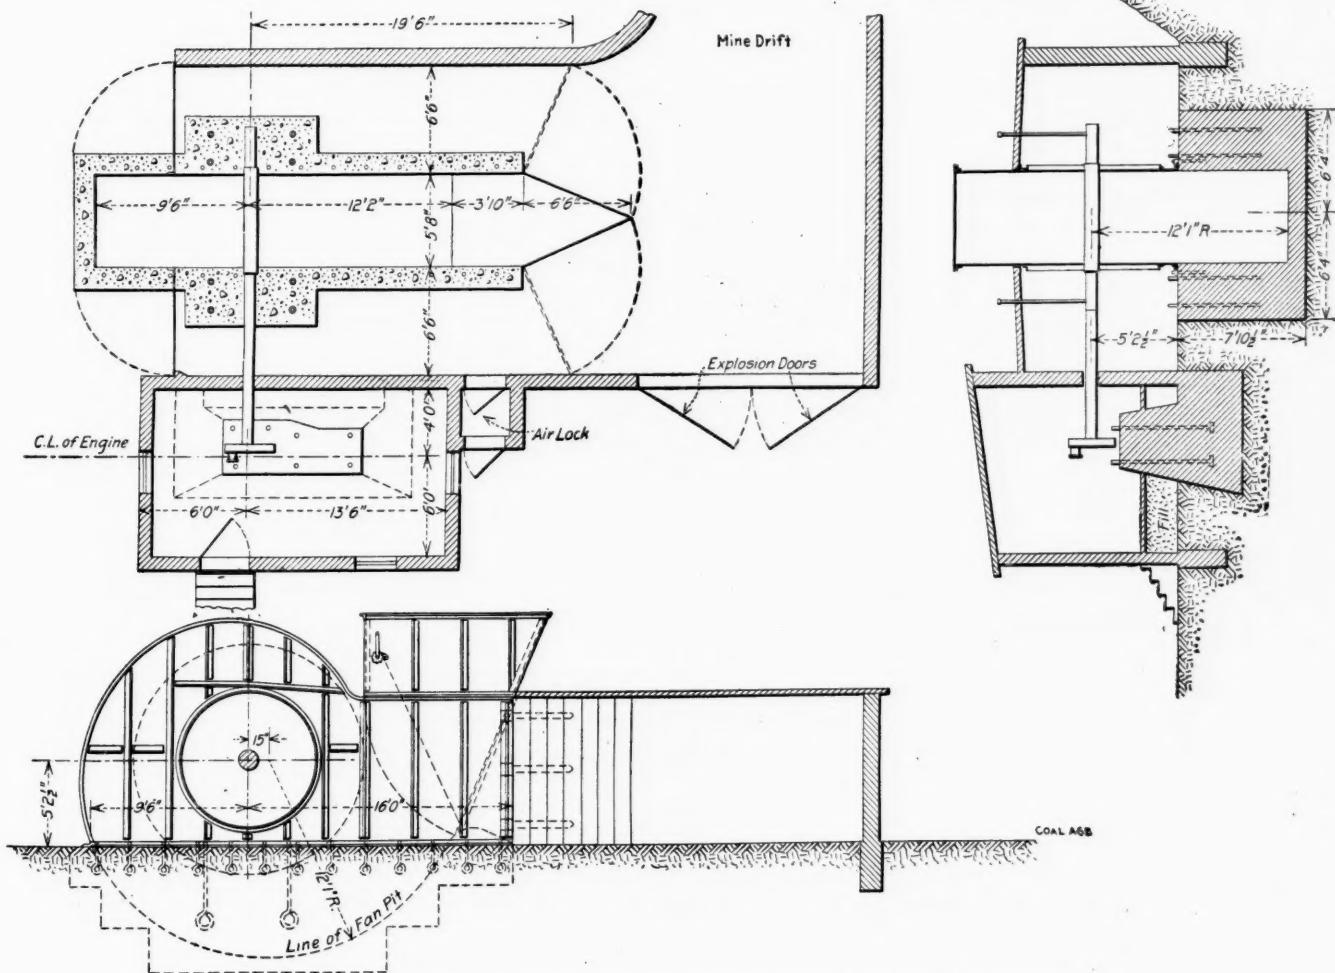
PLAN AND ELEVATIONS OF JEFFREY DOUBLE-INLET TYPE "D" FAN
